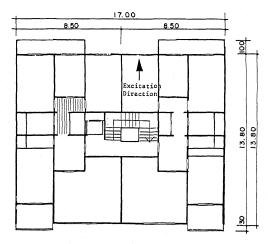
Typical Flor Plan for the 10-Story Structure
